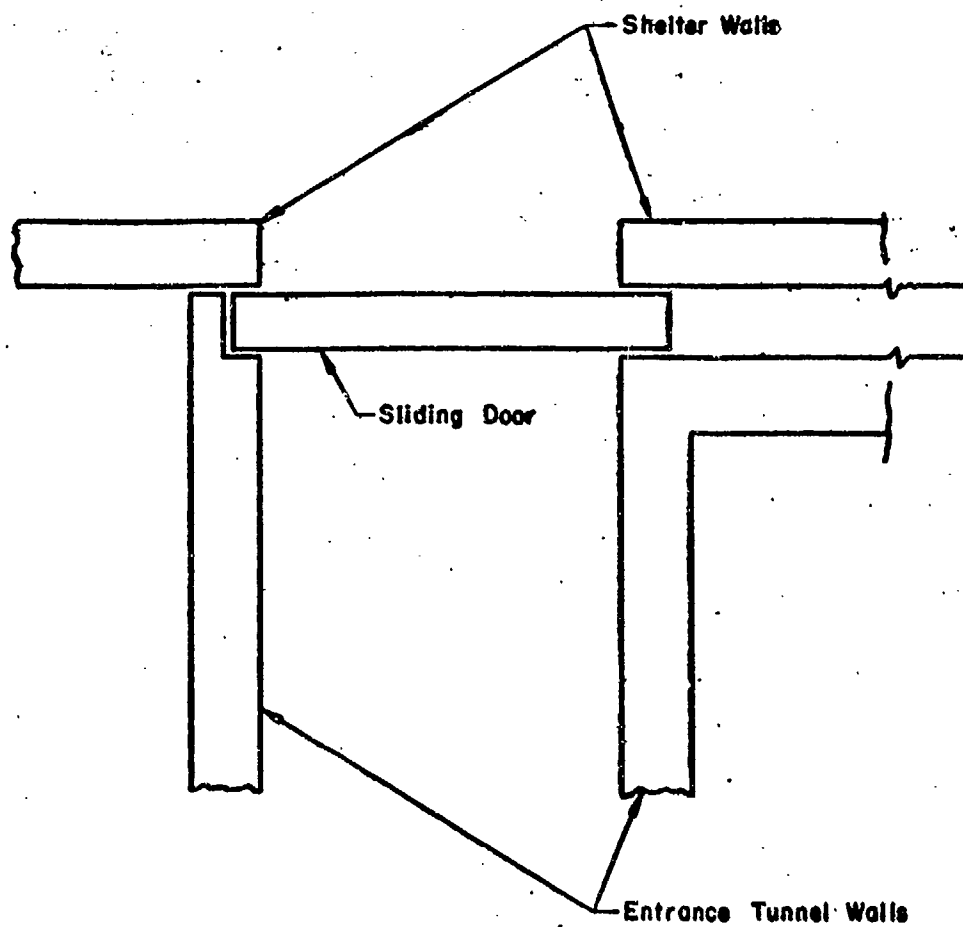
SLIDING DOOR CONFIGURATION ON OUTSIDE OF SHELTER
